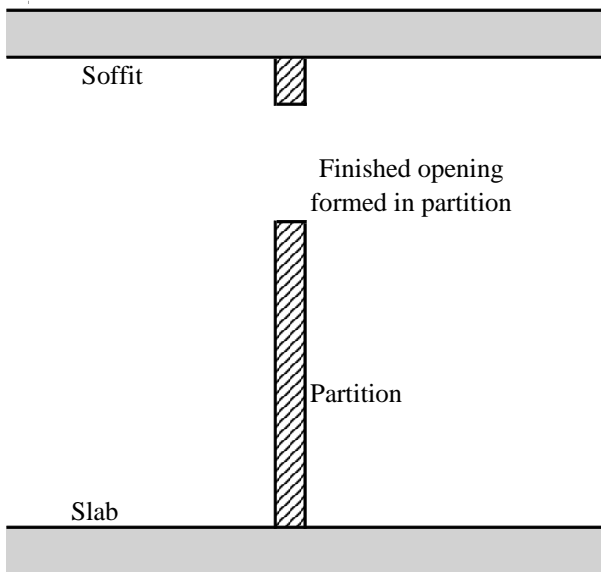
Elevation with partition and designated clearance opening (including expansion allowance) formed to suit the eventual damper / sleeve assembly.
